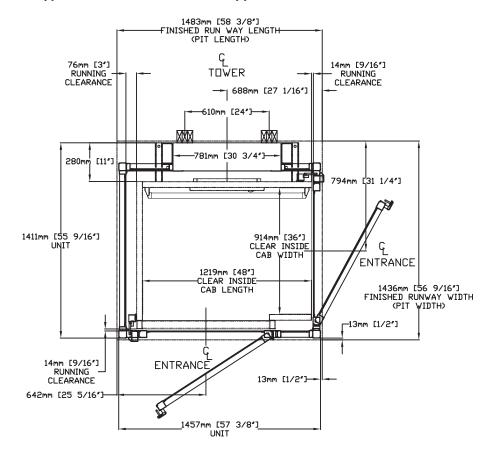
Plan View - Type 3, 36" x 54" Cab, Hoistway Application
